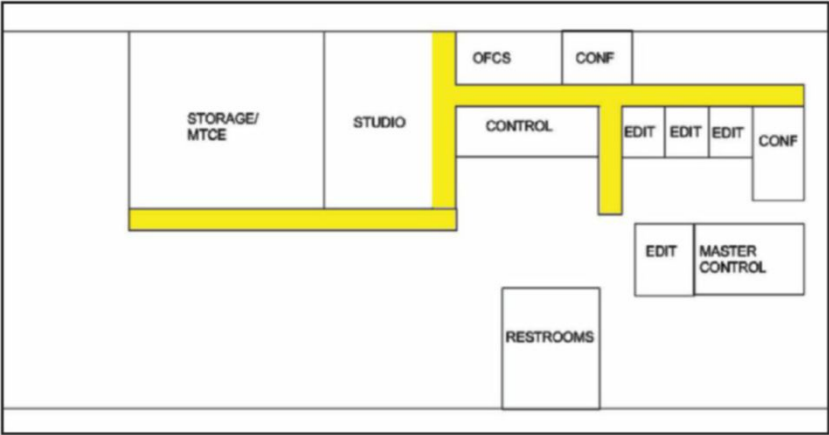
This partial plan of the building shows the studio and related rooms. Yellow areas are corridors, and blank areas are offices, storage, and so forth.
